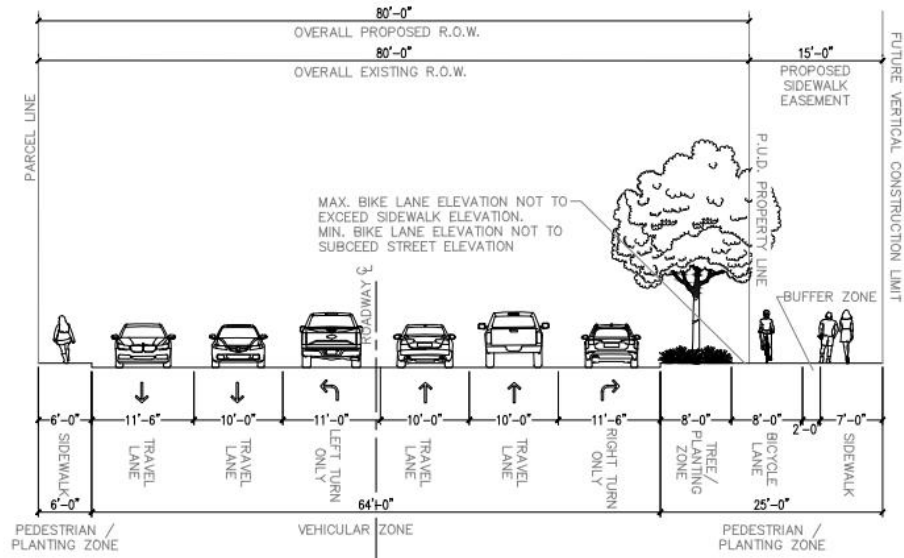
Proposed Riverside Dr cross-section near Haywood Ave
